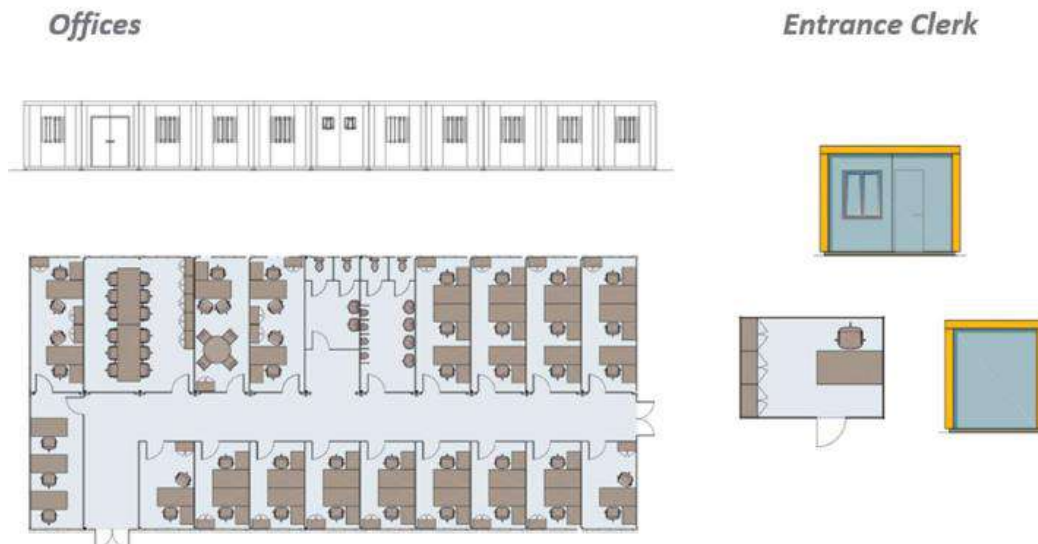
Layout of a jobsite type (Source: QG Konstruktion GmbH).
